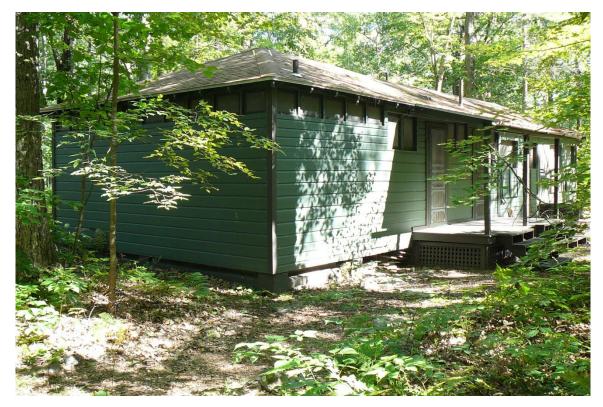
View southeast of the north and west elevations of The Noss (#5).
